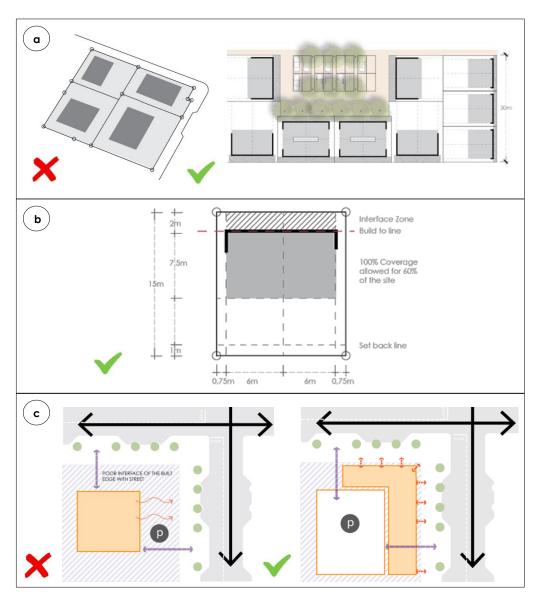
Building placement guidelines – position buildings to optimize space (a); setback lines of no more than 2m from the street (b); and locate parking to the rear of the plot away from the street
